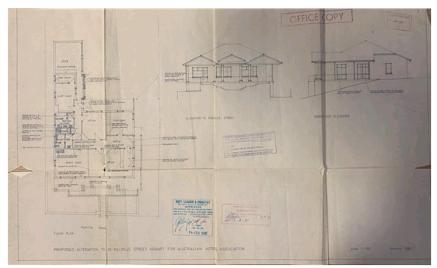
Renovation plans for the 1980s (TAHO: building application record 8645)
